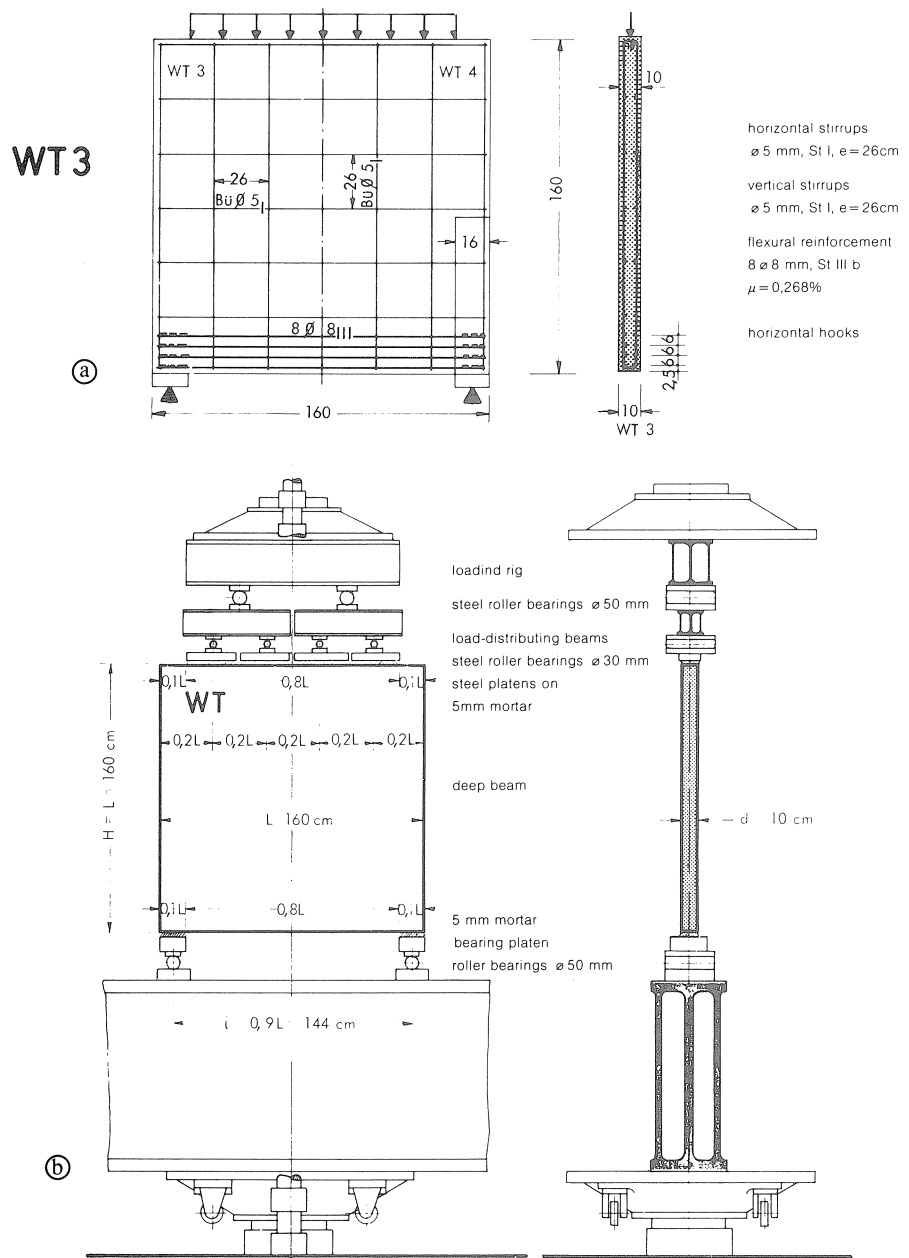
Reinforced concrete panel WT3, dimensions and reinforcement details (a), and test set-up (b).
